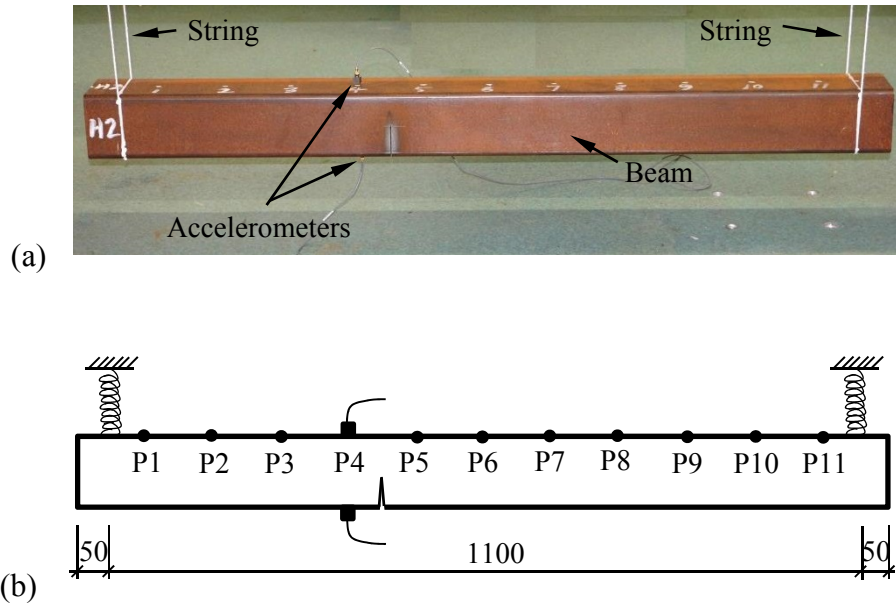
Modal testing setup. (a) Photo of the setup; (b) Schematic view of the setup (Unit: mm).
